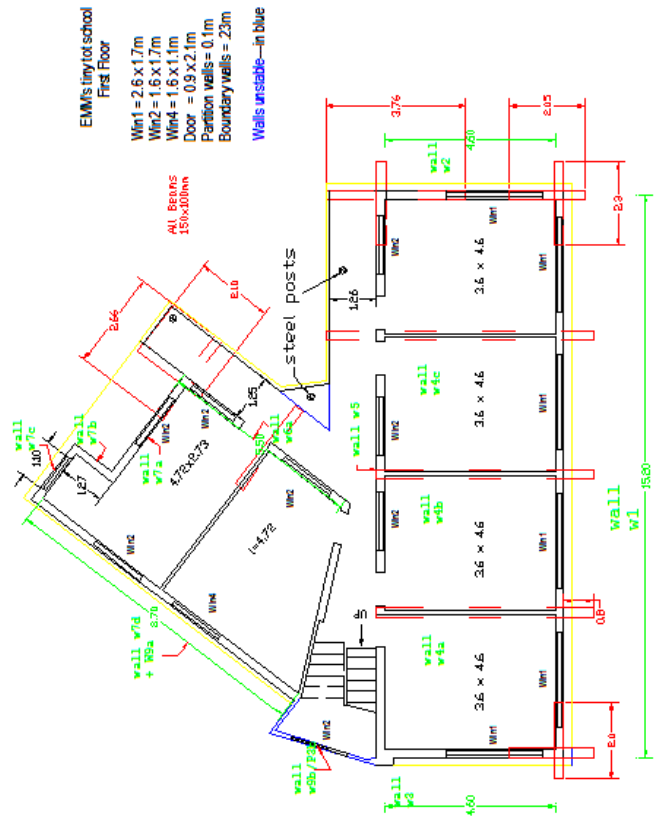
Plan of First Floor and Unstable Walls in Blue
